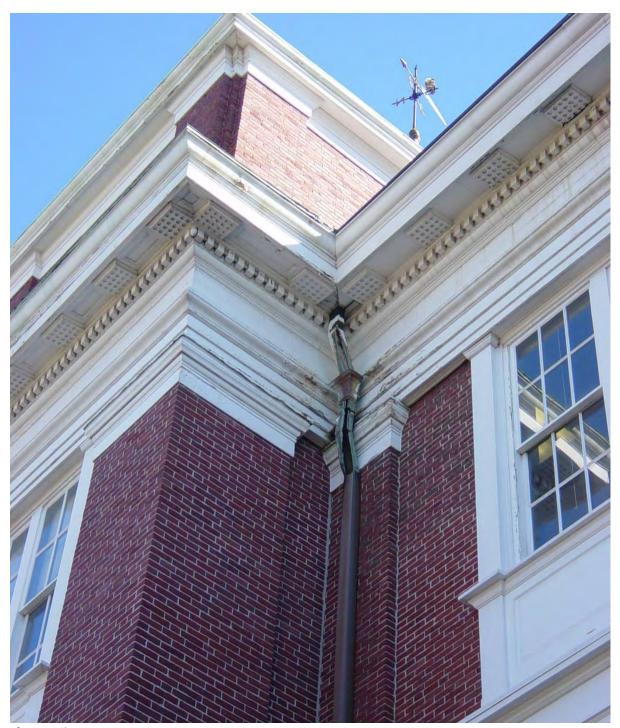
Paint at wood cornices and other wood trim is peeling, in some cases badly. Some copper downspouts have split, causing large amounts of water to spill down the face of the building. Below this downspout, which is adjacent to the Accounting Office, water has damaged the interior wall surface.
